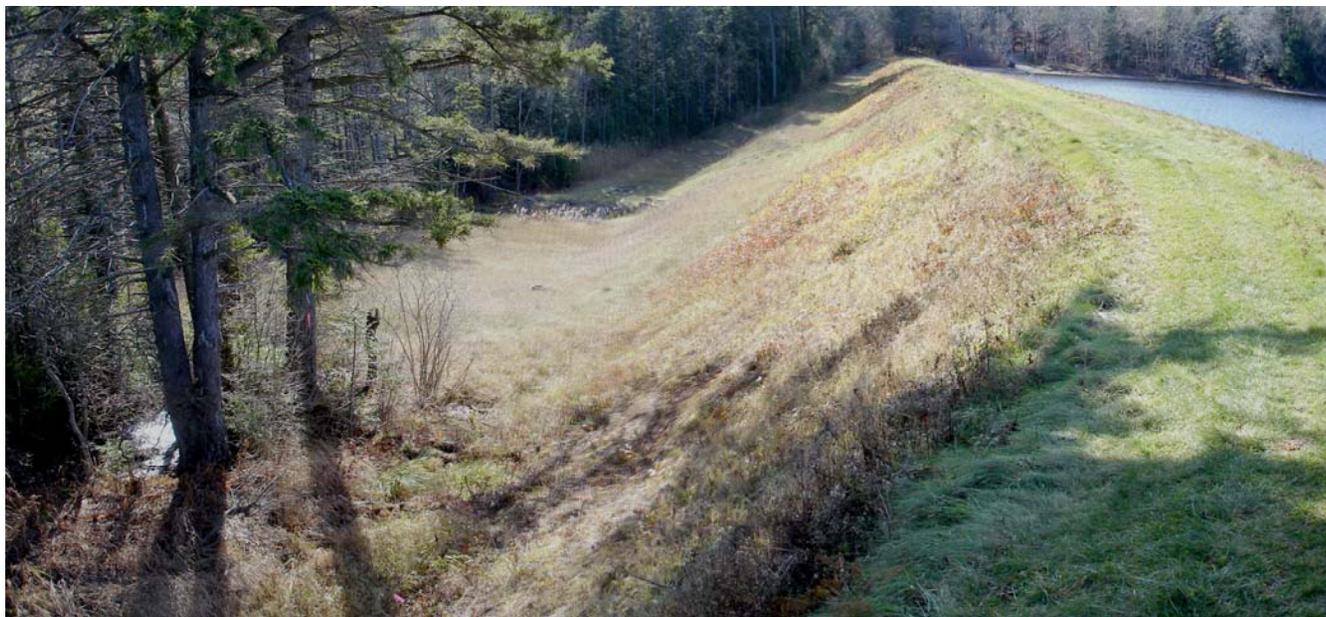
Panorama composite – Crest and downstream slope from ~Sta. 7+00 toward right abutment\
